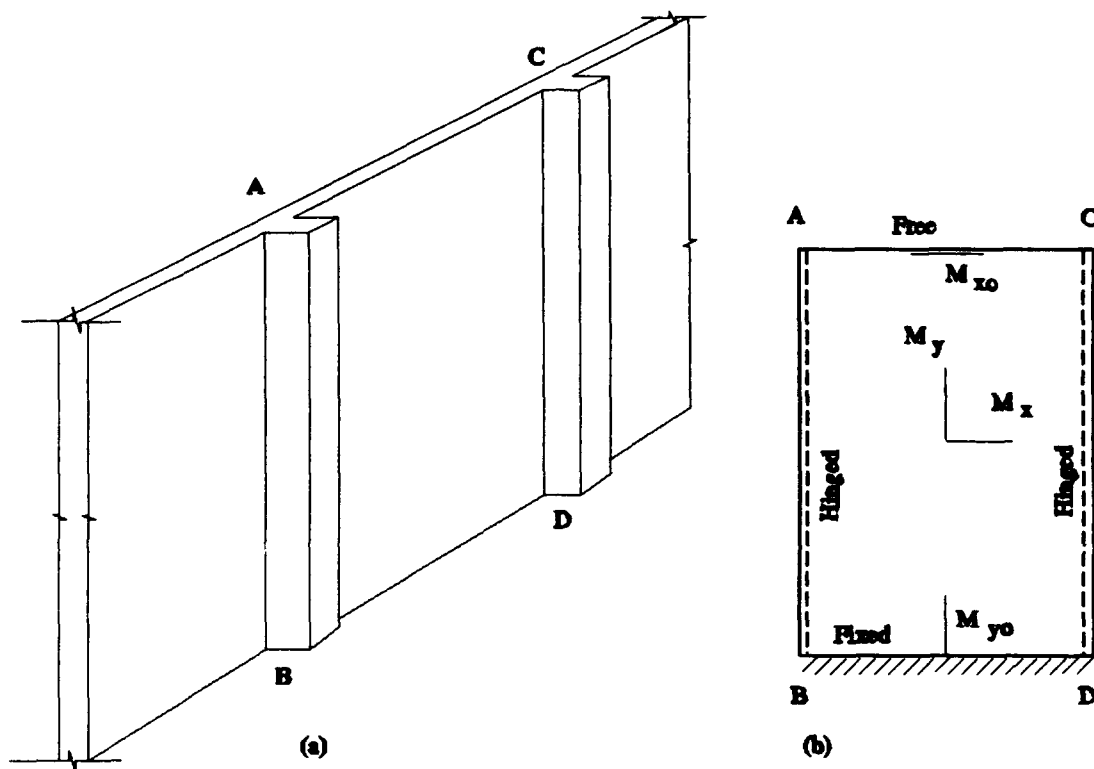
A MODEL OF THE WALL SLAB AND THE CRITICAL LOCATION OF RESPONSES
